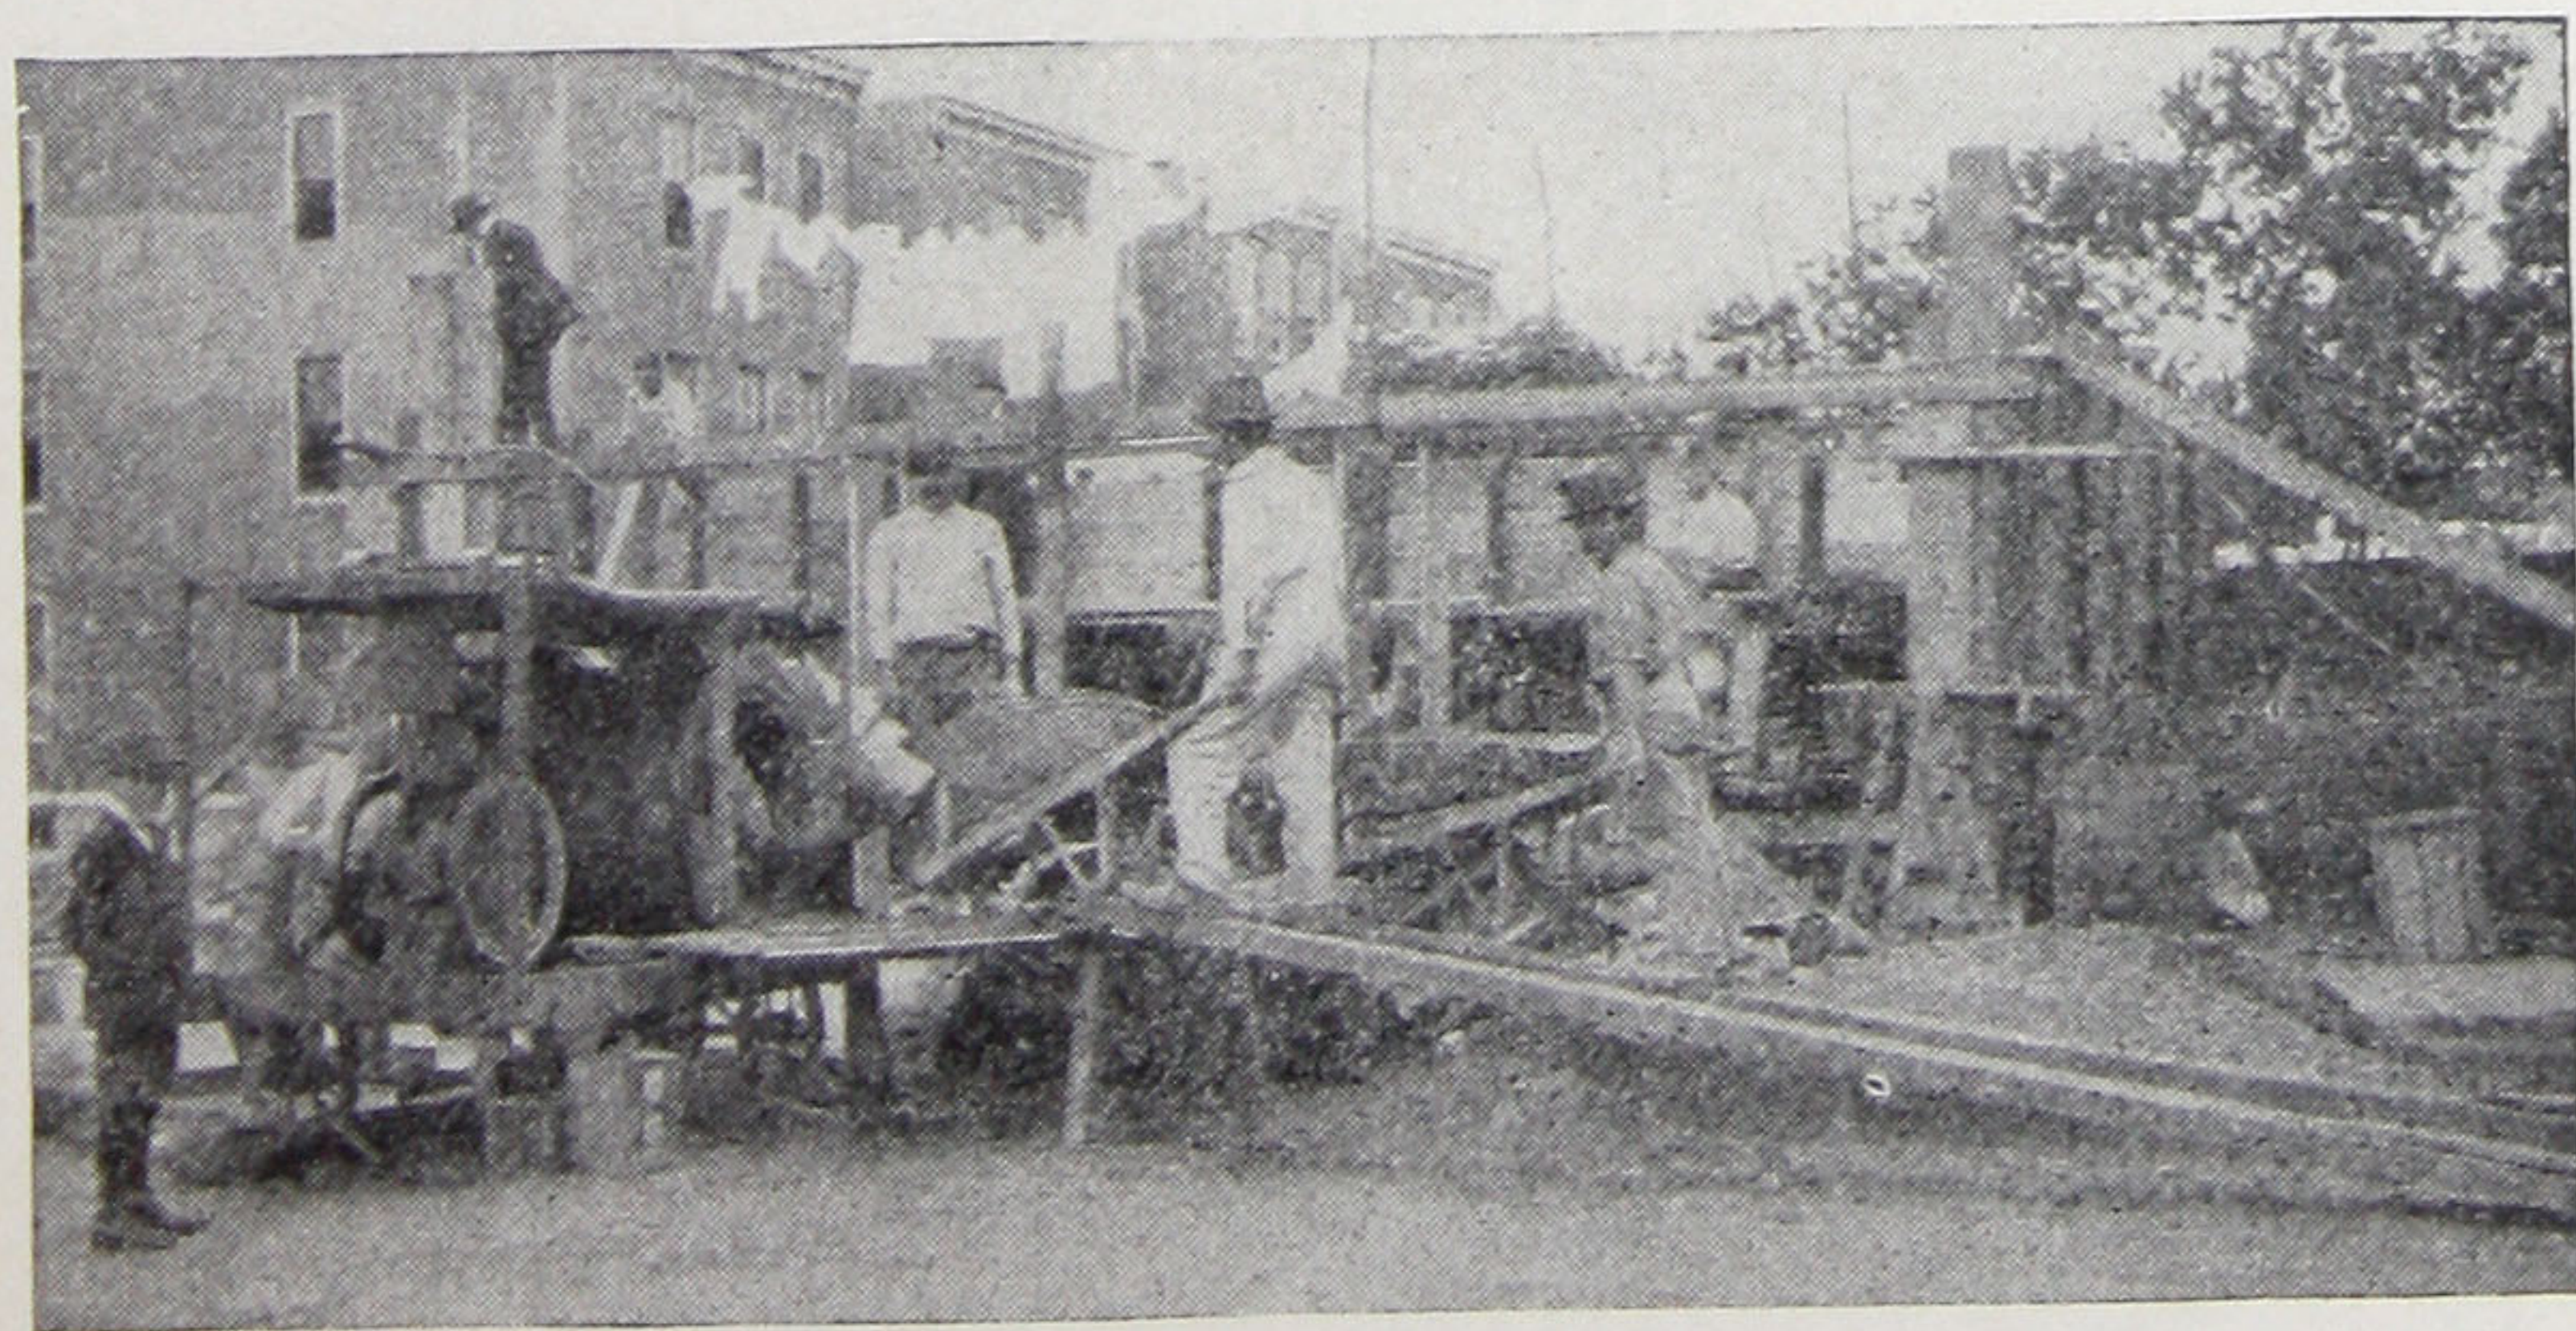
Small gasoline driven concrete mixer. Notice necessity for runways because mixer is not equipped with elevating loader skip.
